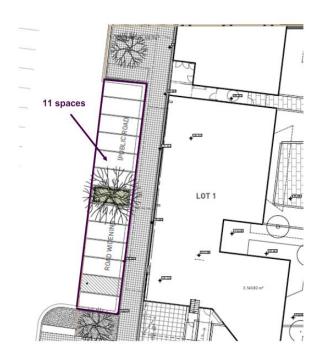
Car parking spaces (11) located at the front of Lot 1 provided for the commercial / retail component of the development
